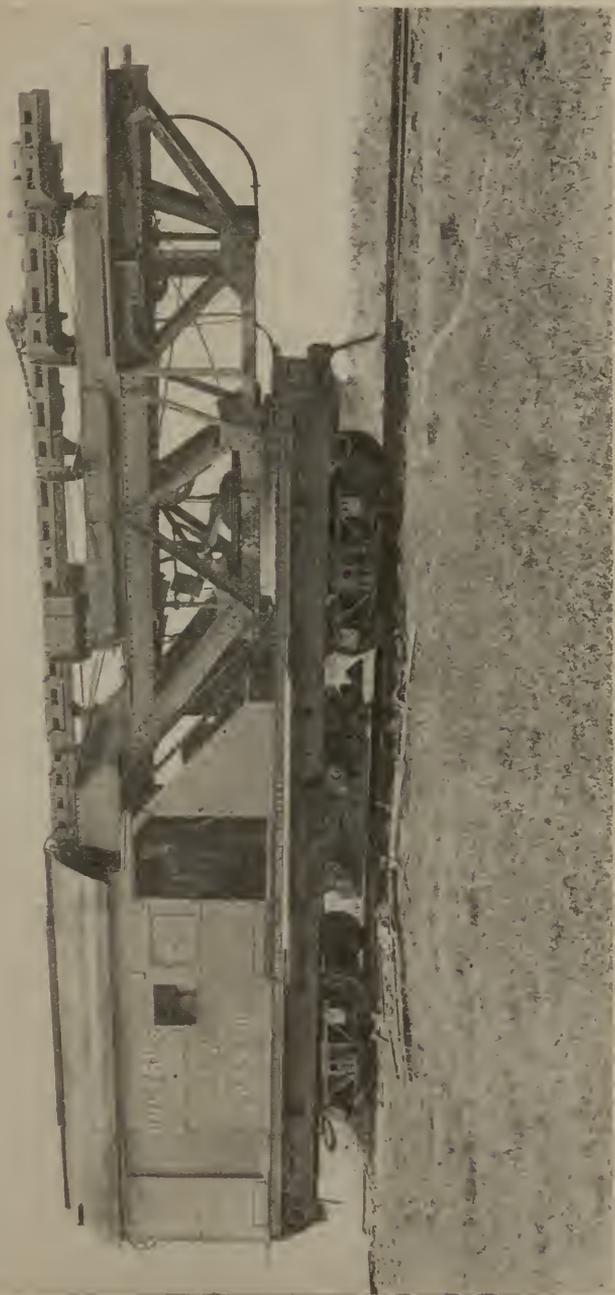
TRACK PILE-DRIVER—ATCHISON, TOPEKA & SANTA FE RAILWAY.
